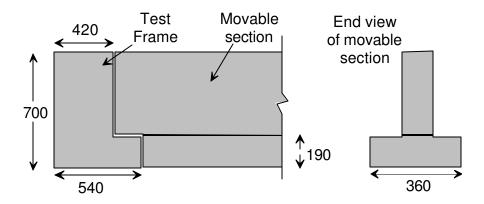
The movable concrete support used to change the floor size by supporting different joist lengths.
